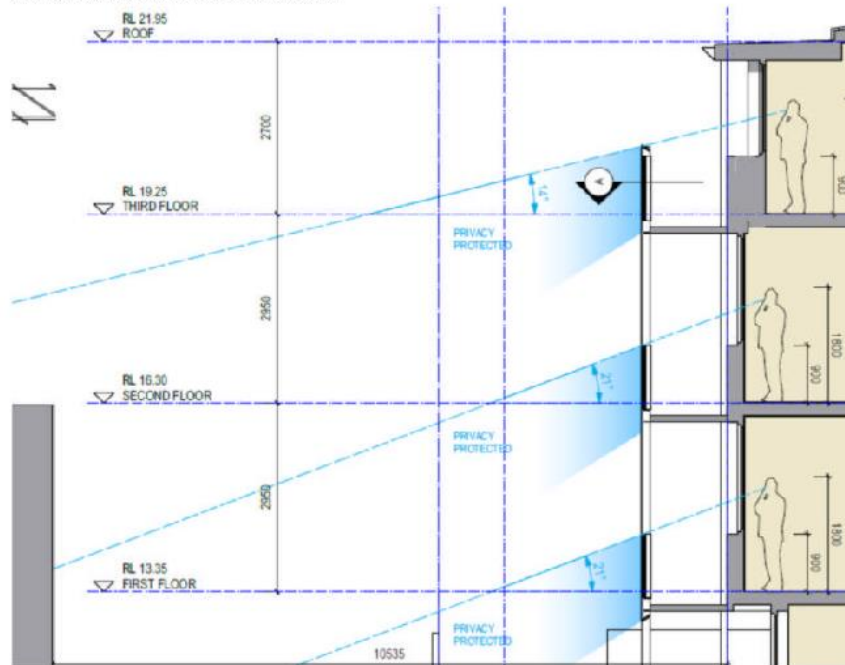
Privacy screens blocking direct sightlines from living rooms to the building to the north
